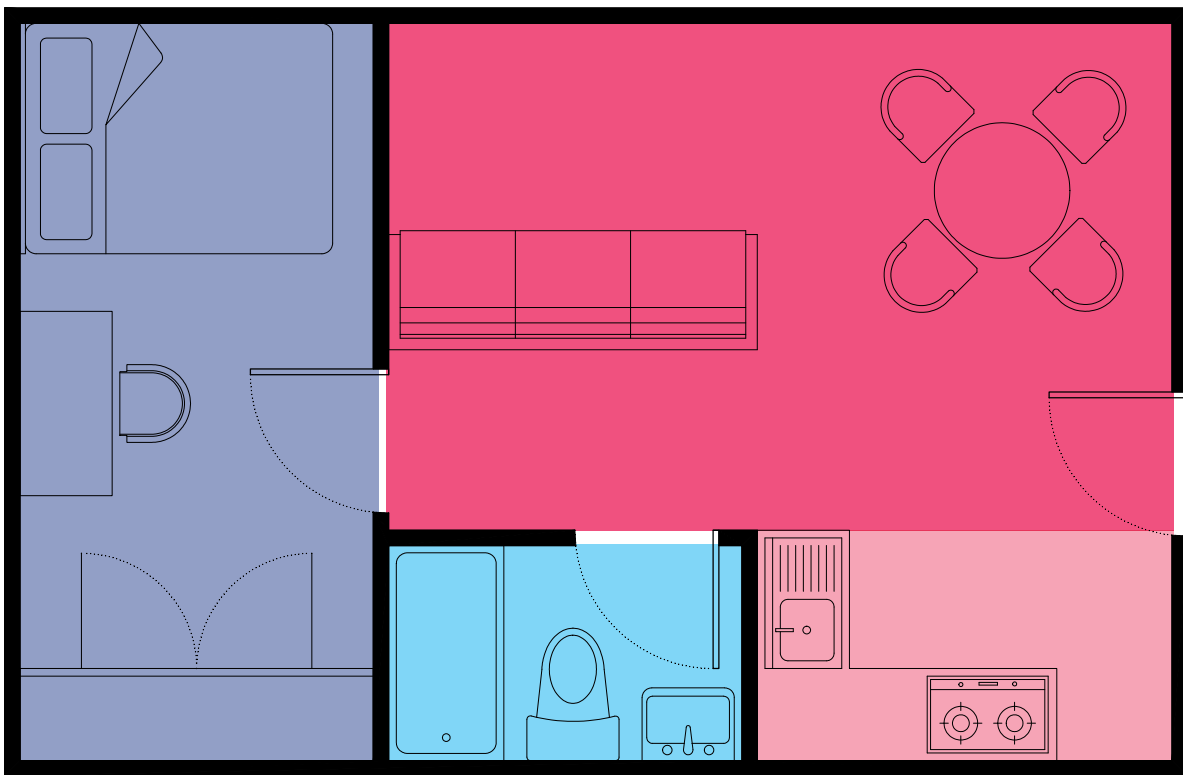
Tiny House Floorplan Concept, 400 ft²
